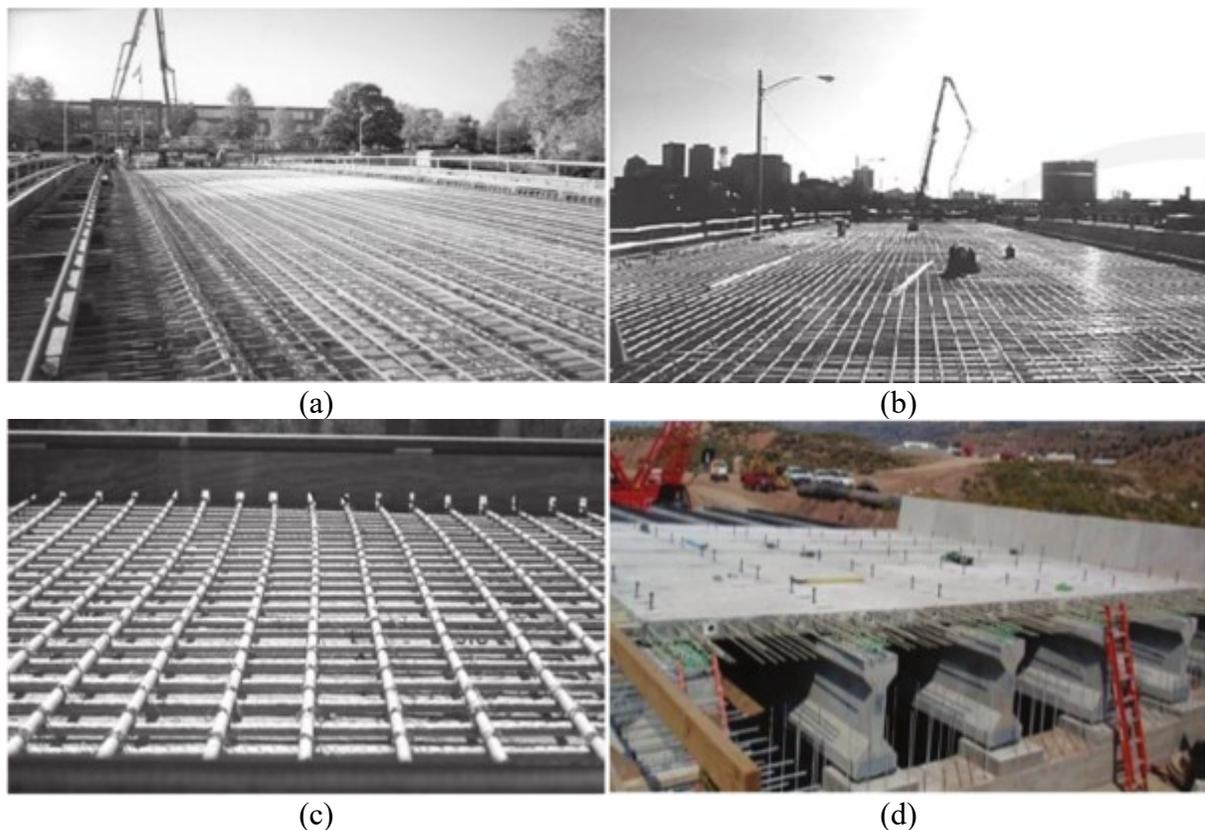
Bridge deck construction using FRP reinforcement bars in (a) Lima, OH - Pierce Street Bridge; (b) Dayton, OH, Salem Avenue Bridge; (c) Sierrita de la Cruz Creek Bridge deck near Amarillo, TX; and (d) Emma Park Bridge deck panel [ACI 544.7R-16].
